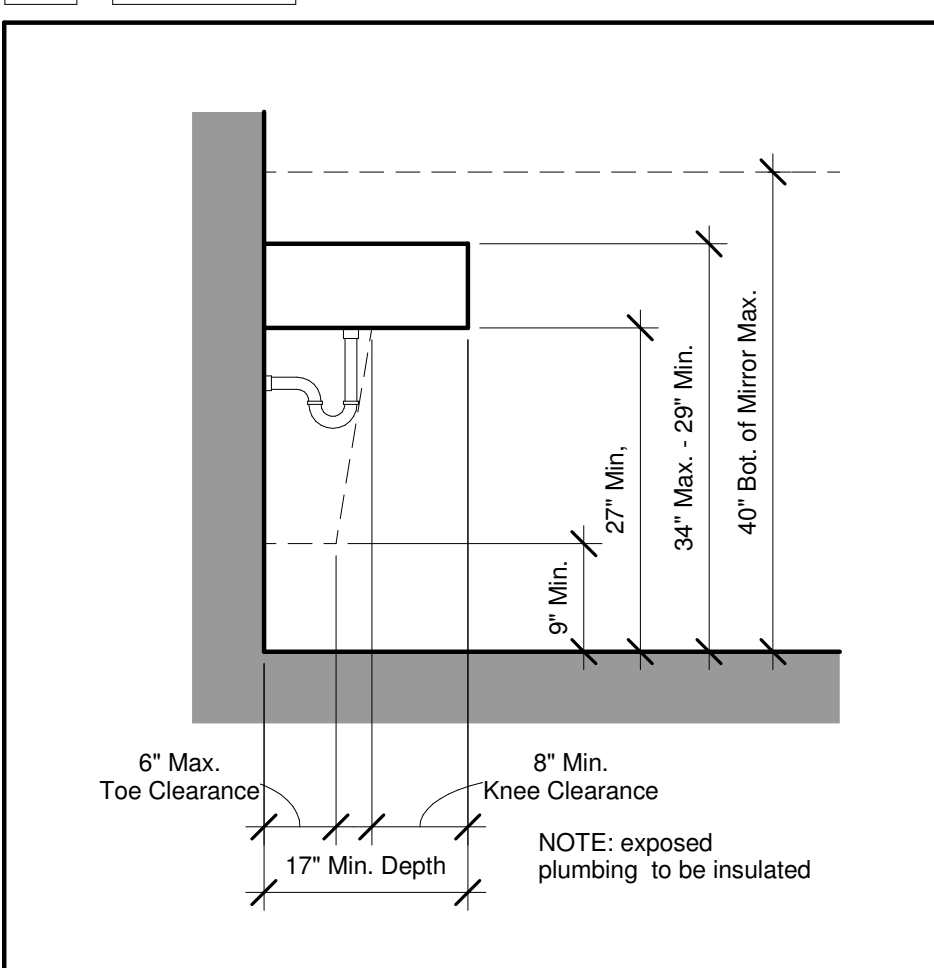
3/4" = 1'-0" Cabinetry Section
